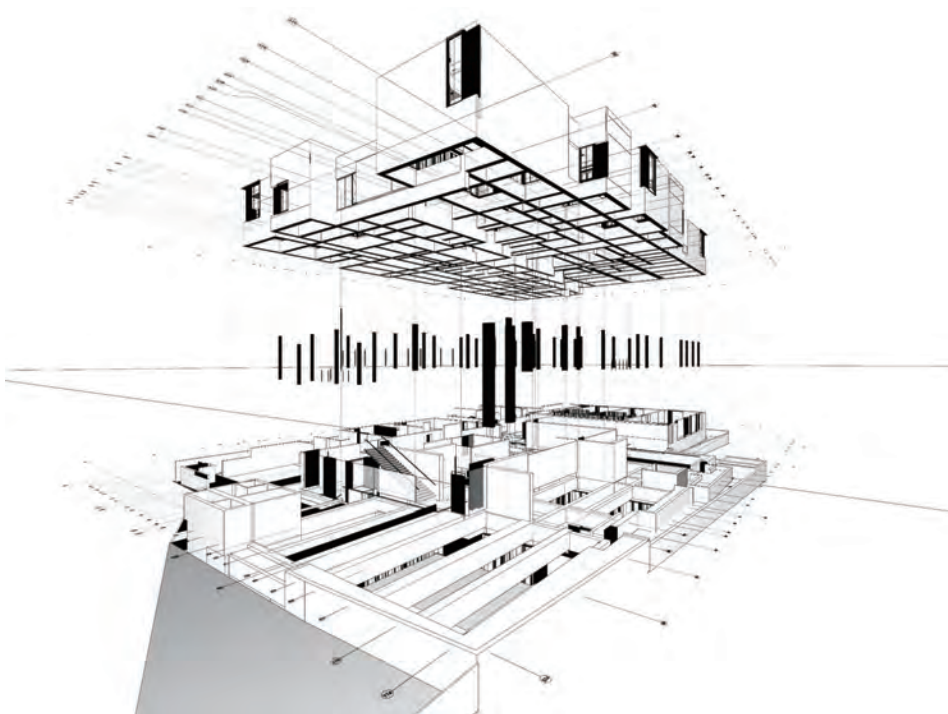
No. 1 Building of Toho Gakuen Chofu Campus
